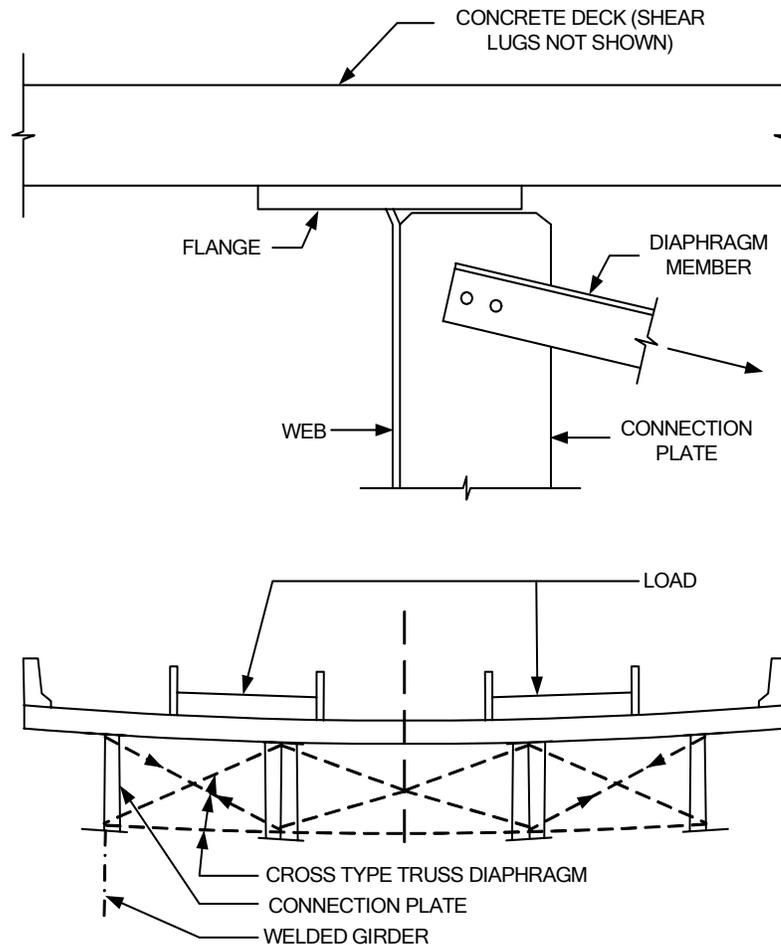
Out-Of-Plane Distortion in Web Gap at End of Transverse Connection Plate
